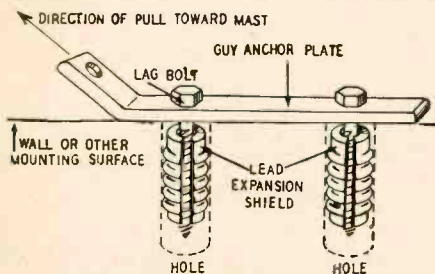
Typical guy anchor plate for anchoring guy wire to masonry or brick wall.
